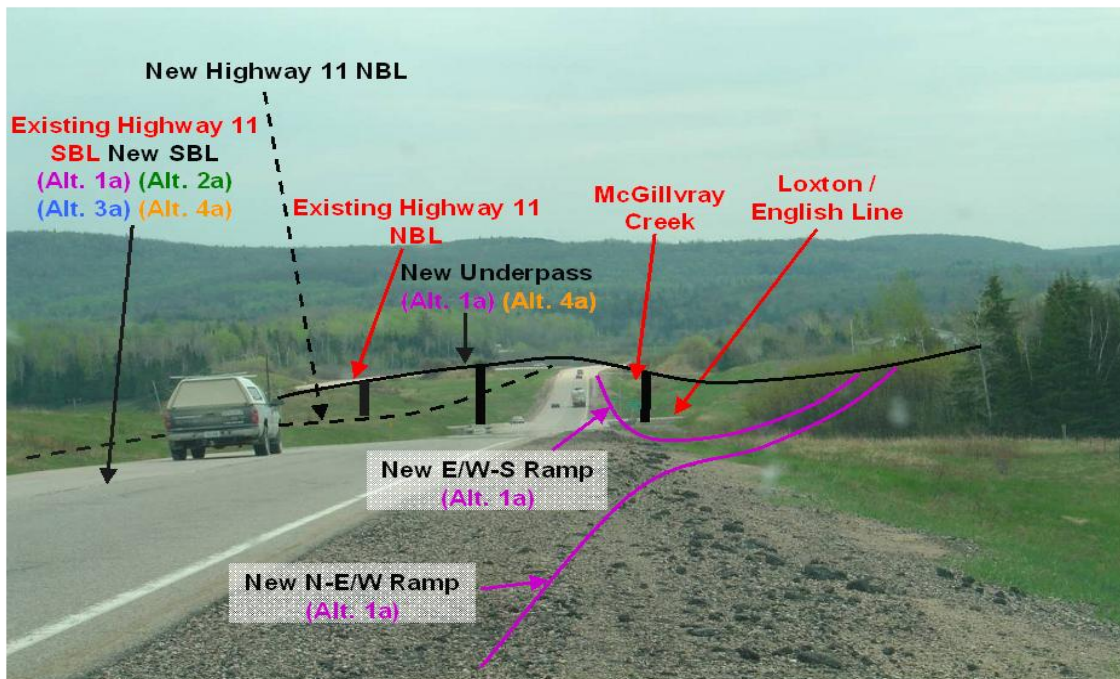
View looking north from 20 m west of Highway 11 SBL at about Station 20+050, across McGillvray Creek floodplain and bridge structure. (May 8, 2007)
